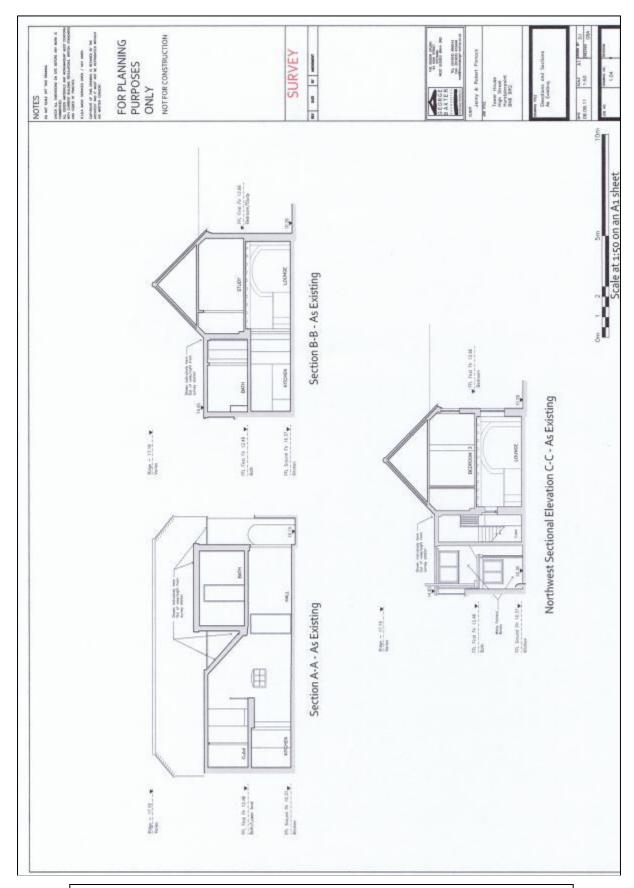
Tower House, Hurstpierpoint: Existing Sections of Tower House (Adapted from architects drawing)
